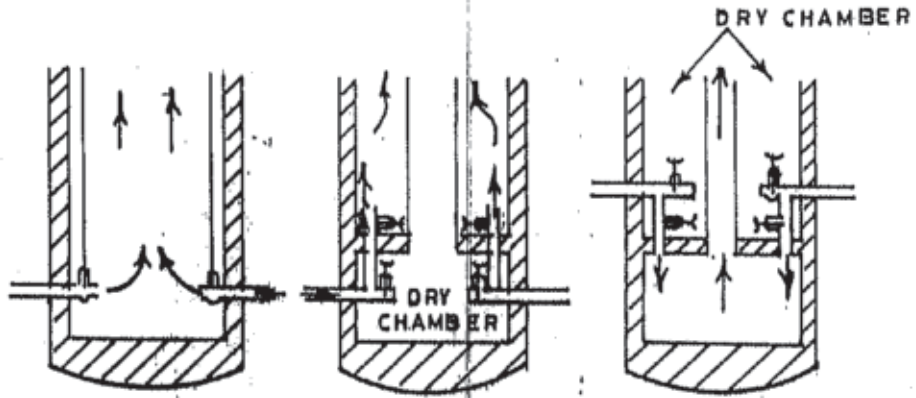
ACCESSIBILITY OF INDIVIDUAL COLLECTORS
